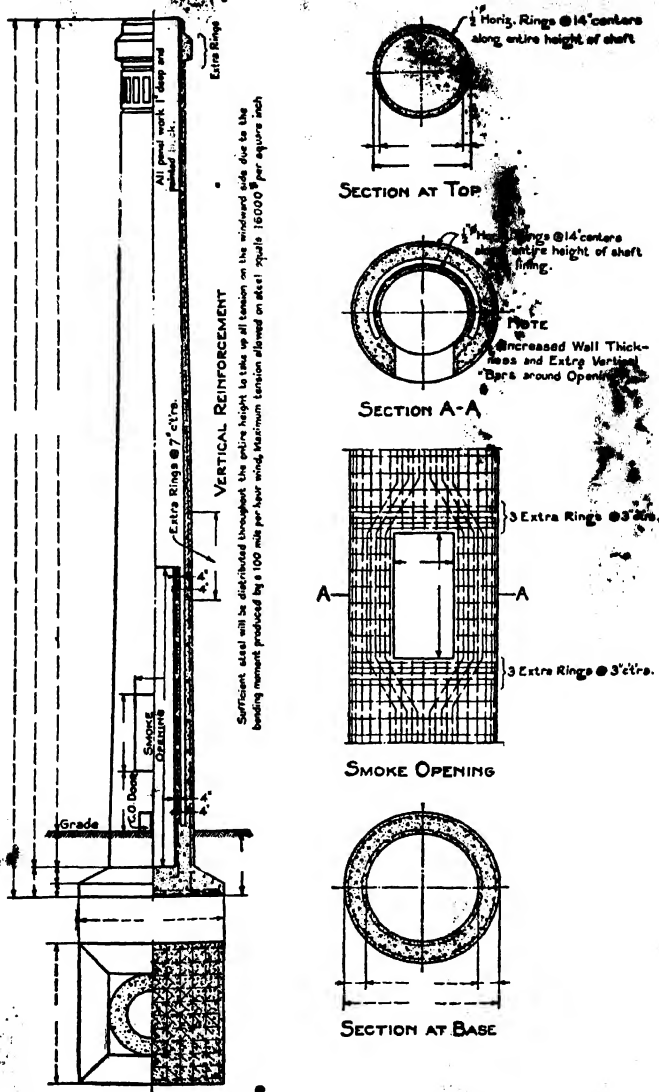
Reinforced concrete chimney built by the Weber Chimney Co.
